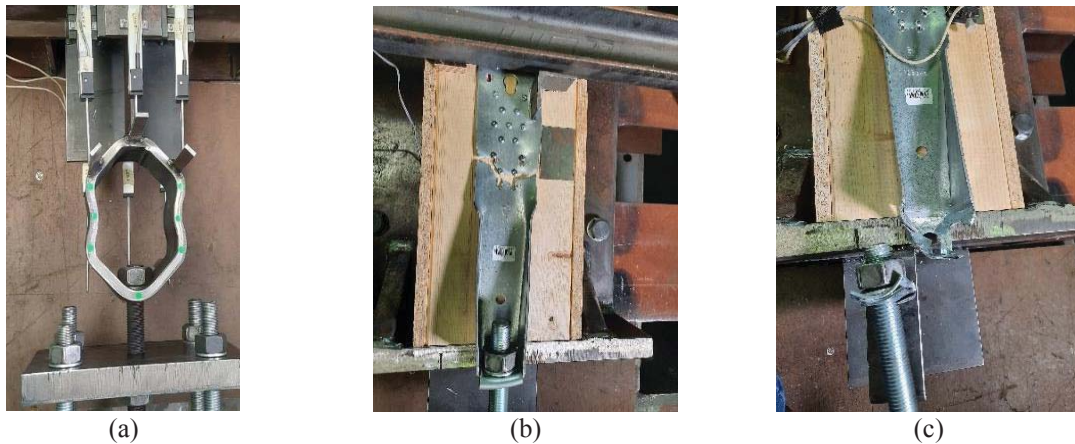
(a) Novel anchorage after loading with 230 kN and 94 mm deformation, (b) Failure mode of HTT31- (A2) specimen, (c) Failure mode of HTT31 - (A3) specimen
